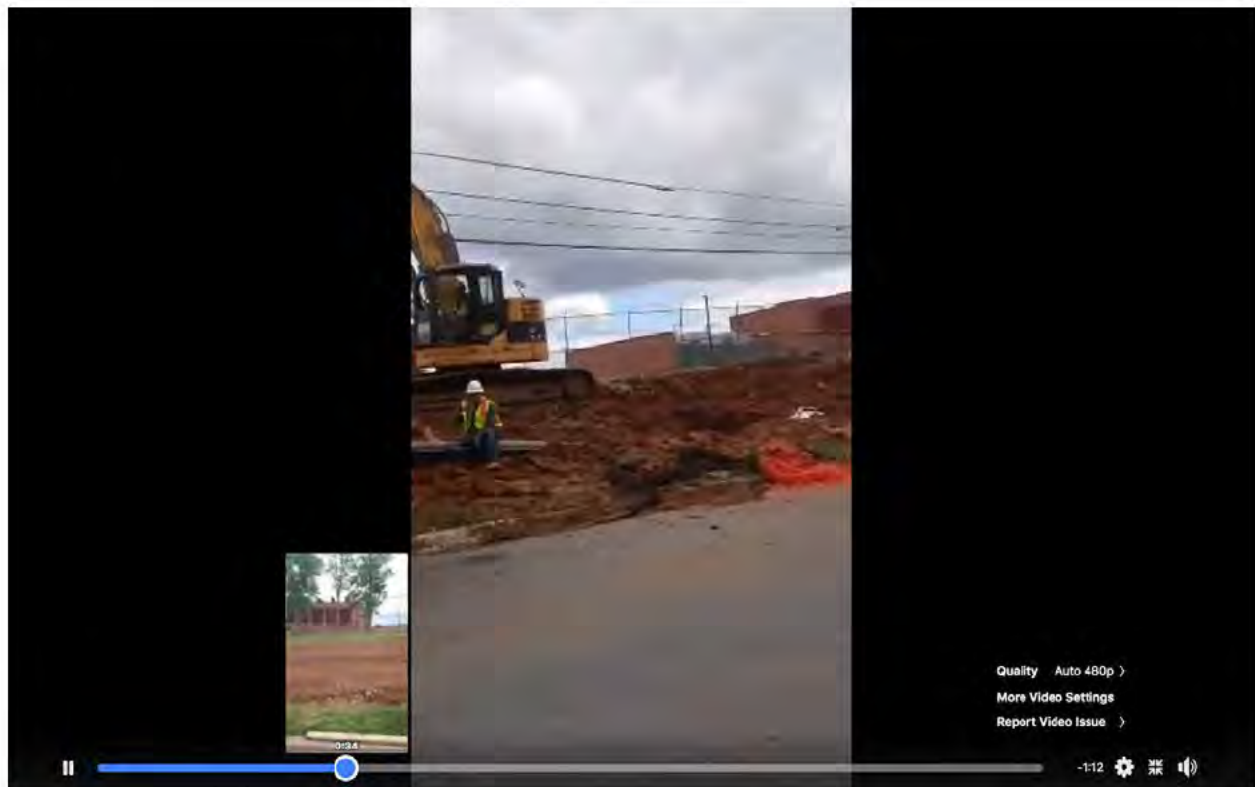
EXHIBIT XX - CONSTRUCTION METHOD FOR EDGE OF ROAD (LONGITUDINAL) PIPELINE INSTALLATIONS
